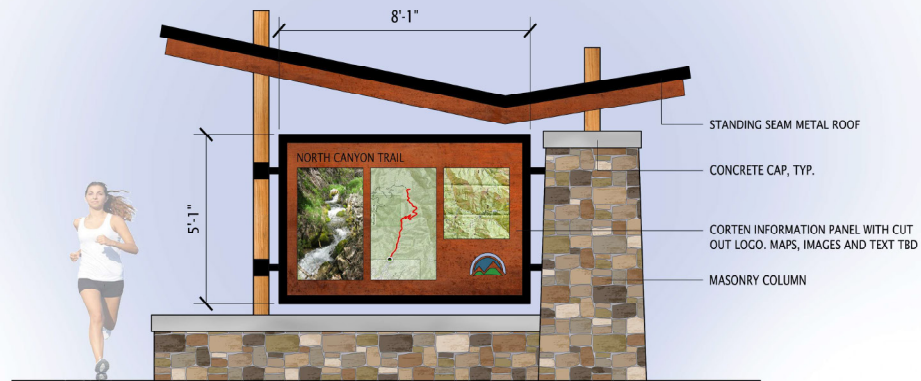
TRAILHEAD SIGN & KIOSK (BACK)
